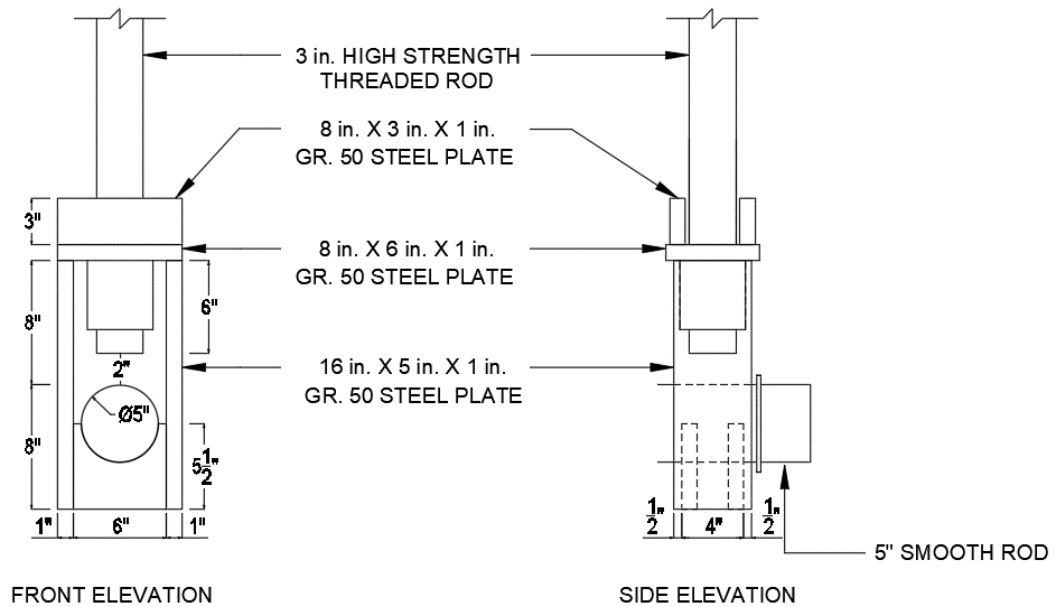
Details of fixture for axial restraint of CB2AD (1 in. = 25.4 mm)
